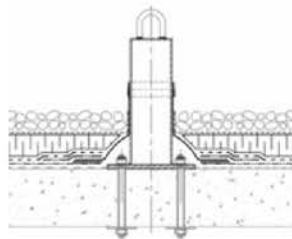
Mechanically fastened anchor (note bolts through slab and fastened on underside)
